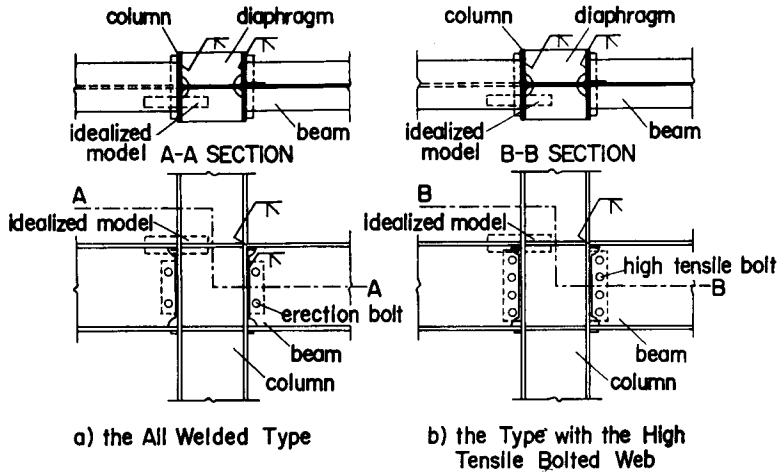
Typical Welded Beam-to-Column Joints
